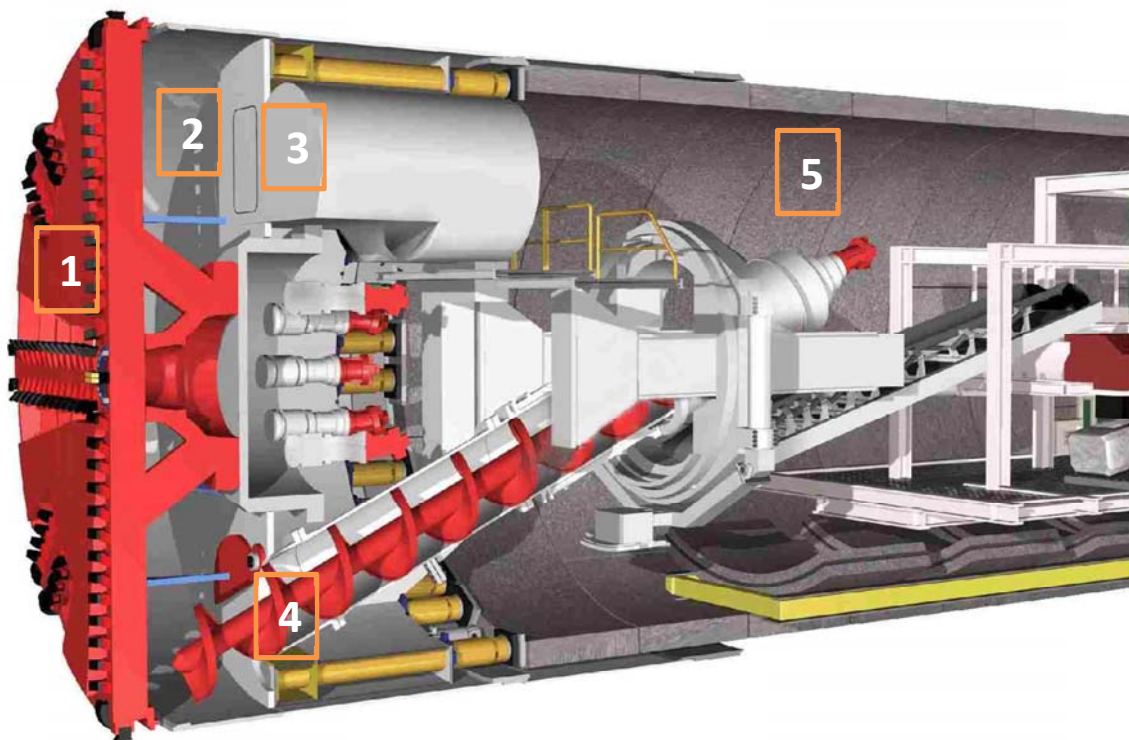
EPB tunnelling machine, Herrenknecht AG, www.herrenknecht.de, access: 17.07.2012
